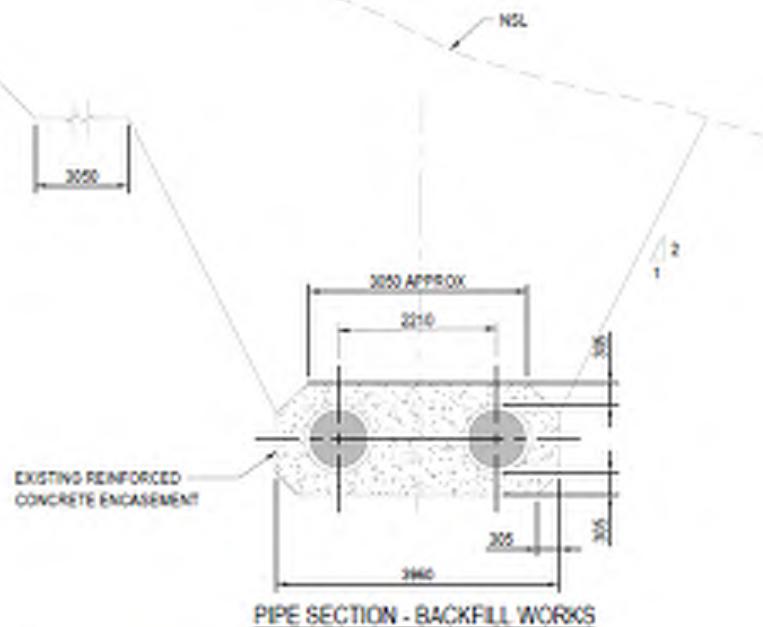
Typical cross section of High Level Outlet Pipes – Option 1D
